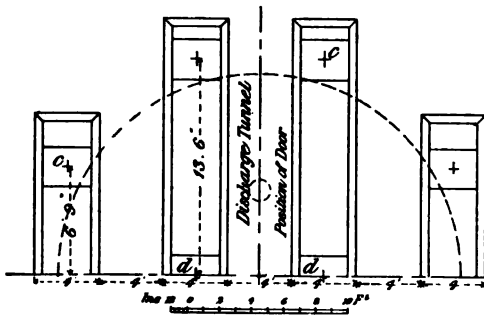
Pier for Double-tier Vats; Half Plan.
